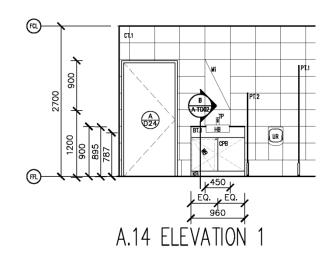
Detail drawings: 1:10, 1:5, 1:2 1:1 (full size)
